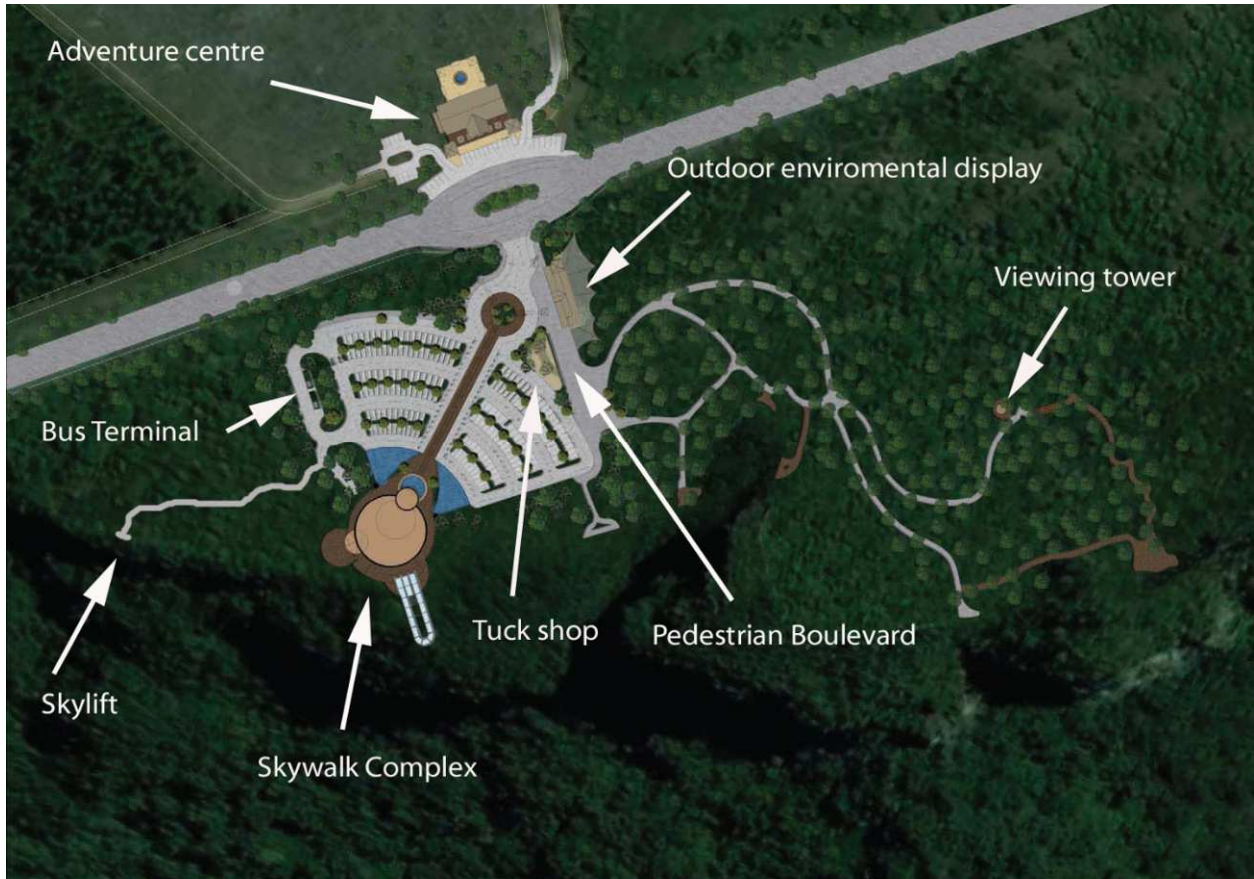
Preliminary proposed layout of multiple tourist facilities for the study area. Note that not all aspects depicted above are assessed in current impact assessment
